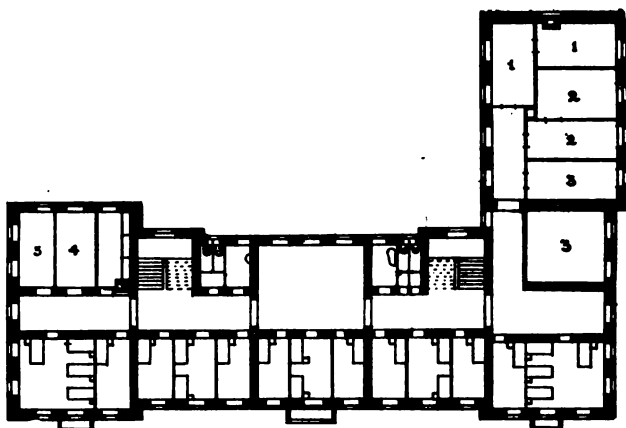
THE BASEL SANATORIUM AT DAVOS.—GROUND FLOOR AND BASEMENT.
